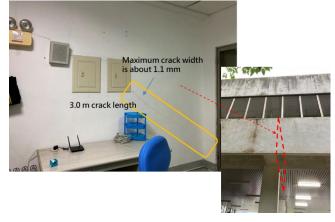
A few of the partition walls on the second floor of Lu-Ye Station, Taitung County Fire Department were cracked (PGA: 53 gal.).
